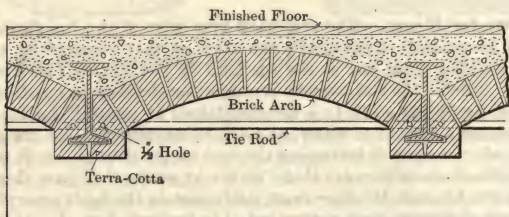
Brick Floor-arch. Government Printing Office, Washington, D. C.
